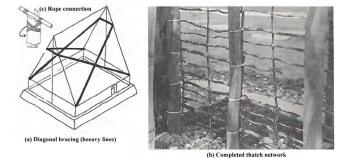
Structure and construction. (a) Diagonal bracing. (b) Completed thatch network (inside view). (c) Rope connection.
